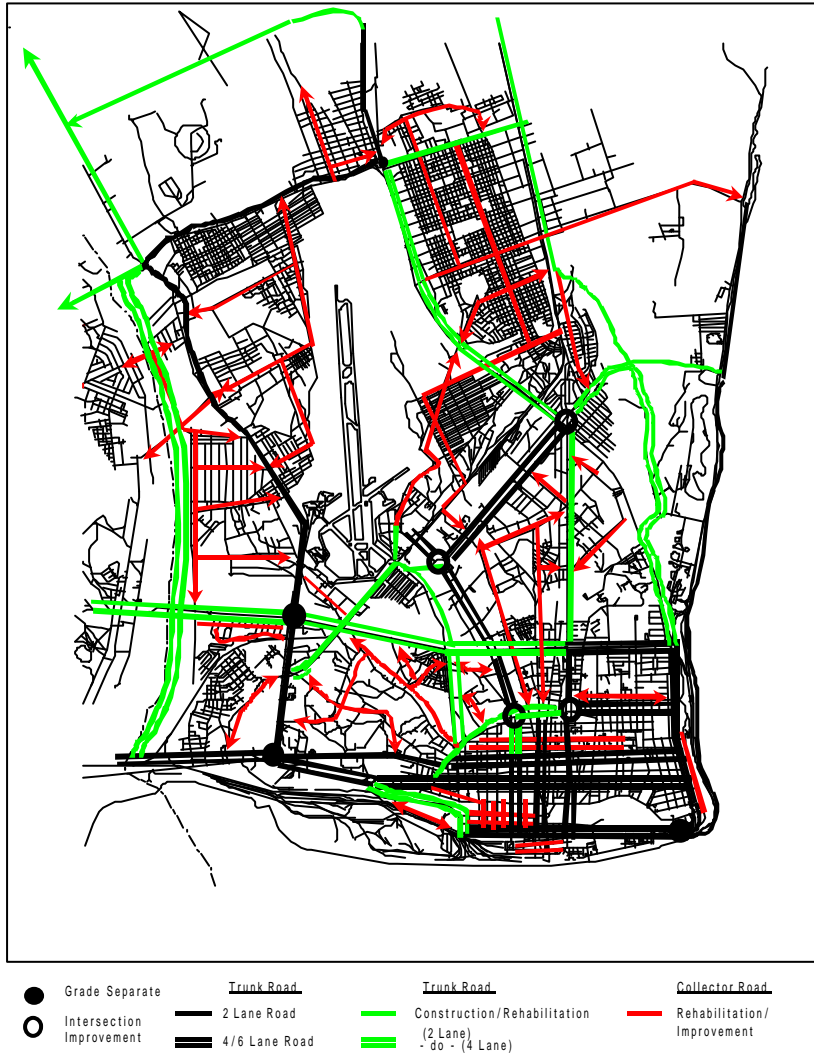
Proposed Road Development Alternative (Plan 5)
